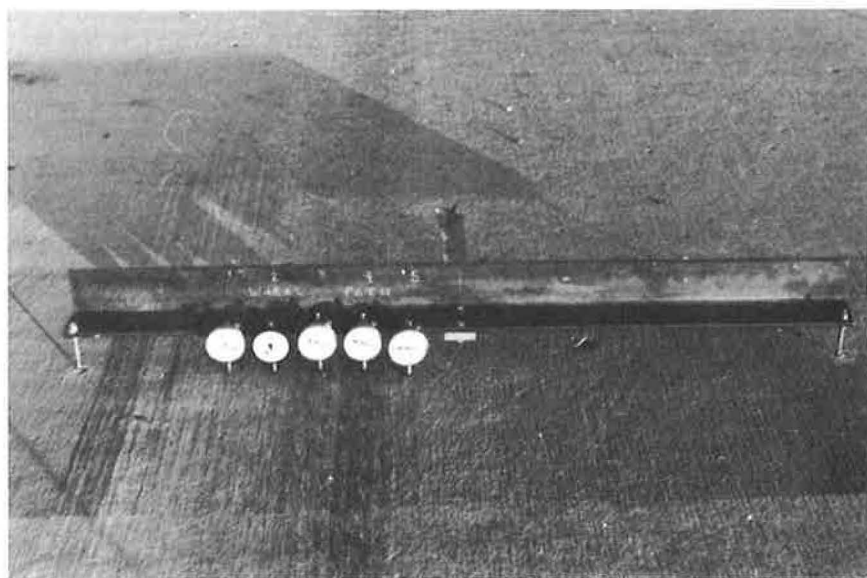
Beam used to measure pavement surface depression, in wheelpath at each test site.
